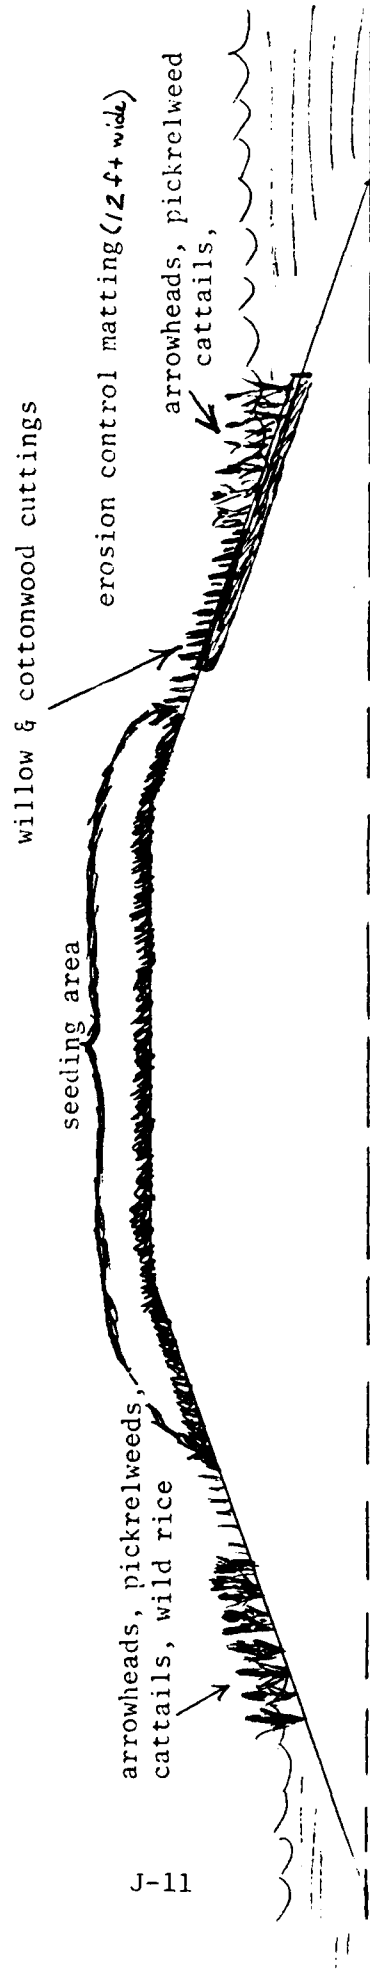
A schematic cross-section of the barrier island, showing planting zones, and placement zone for the erosion control matting.
